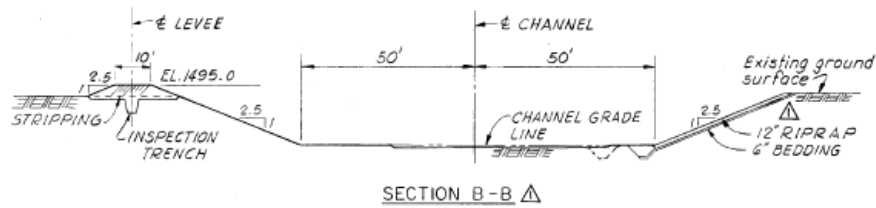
Channel Cross Section directly downstream of W.A. &G. bridge
